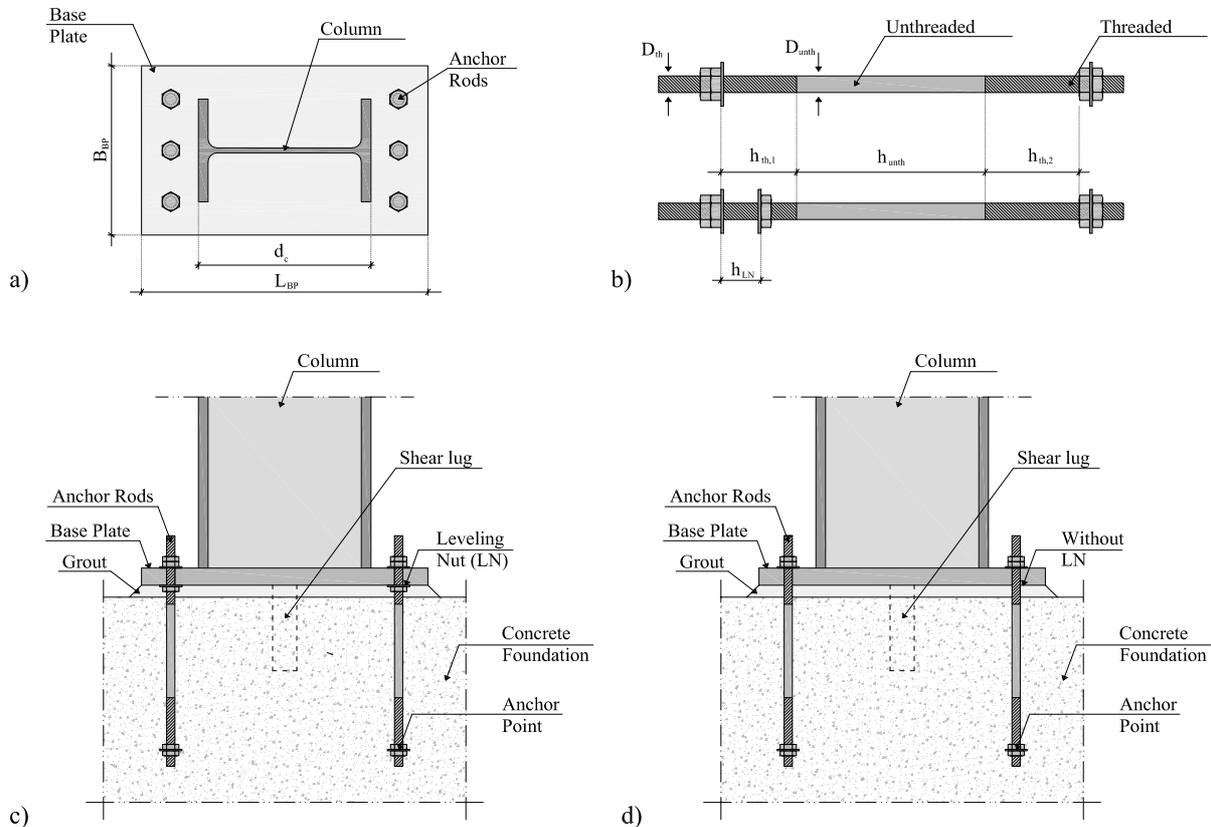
Exposed column base sketch: a) Plan view; b) Anchor rods with/without leveling nut; c) Elevation with leveling nut; d) Elevation without leveling nut
